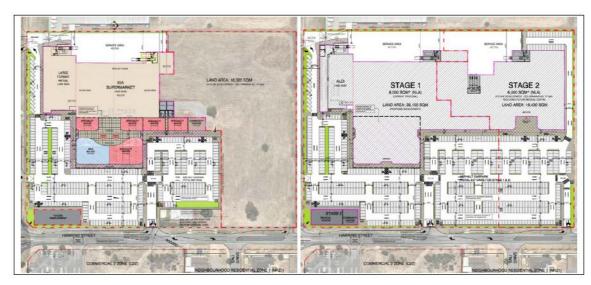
Revised plans for the IGA redevelopment Stage 1 (left) and proposed Stage 2 (right) plans, submitted January 2017.
